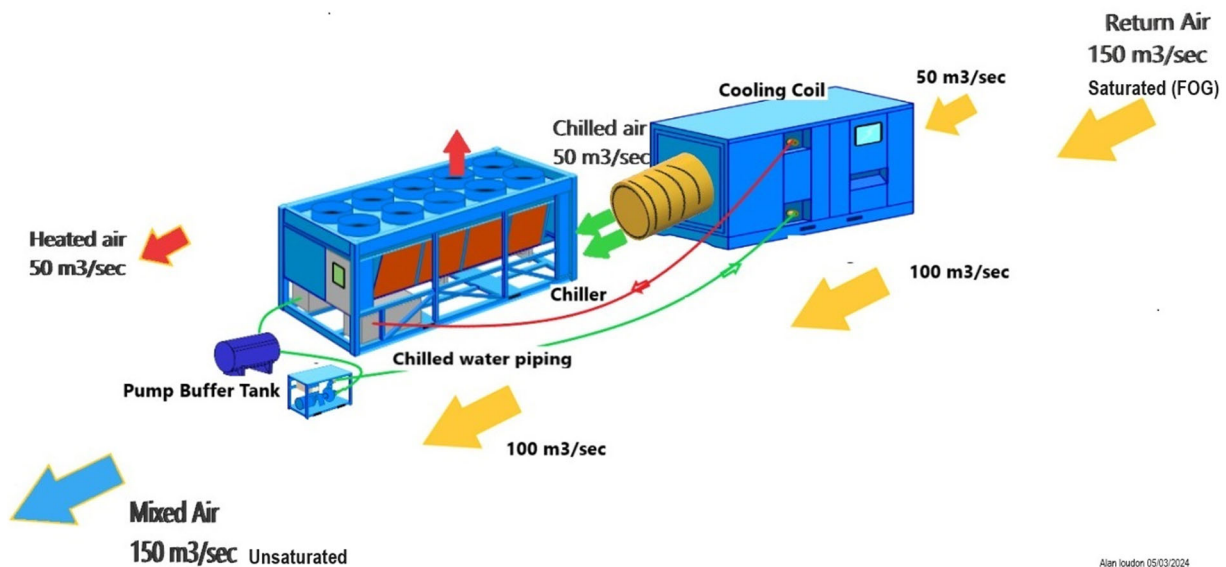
Example layout of an underground refrigeration dehumidification system.
